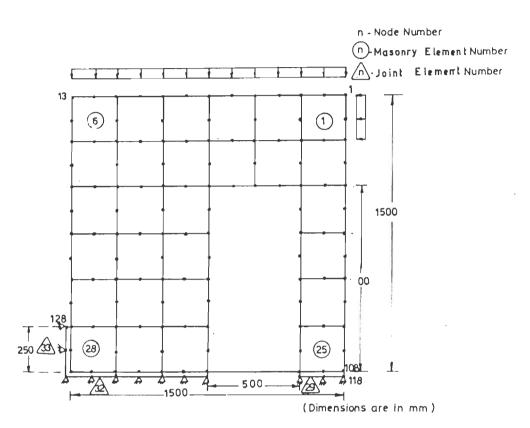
Finite Element Subdivisions of Masonry Shear Wall with Door openig
